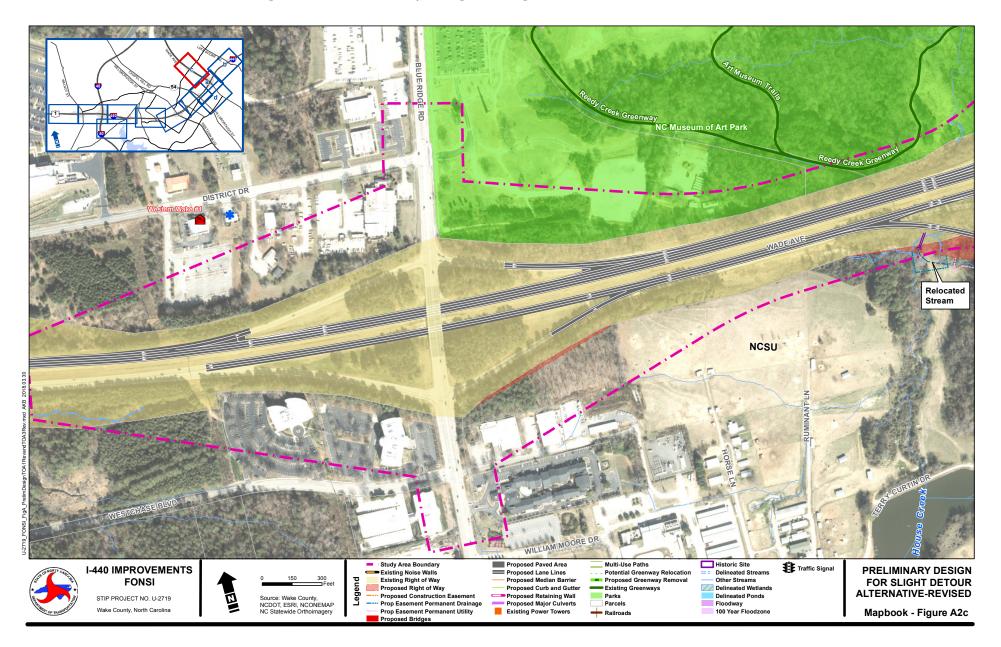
Preliminary Design for Slight Detour Alternative-Revised
